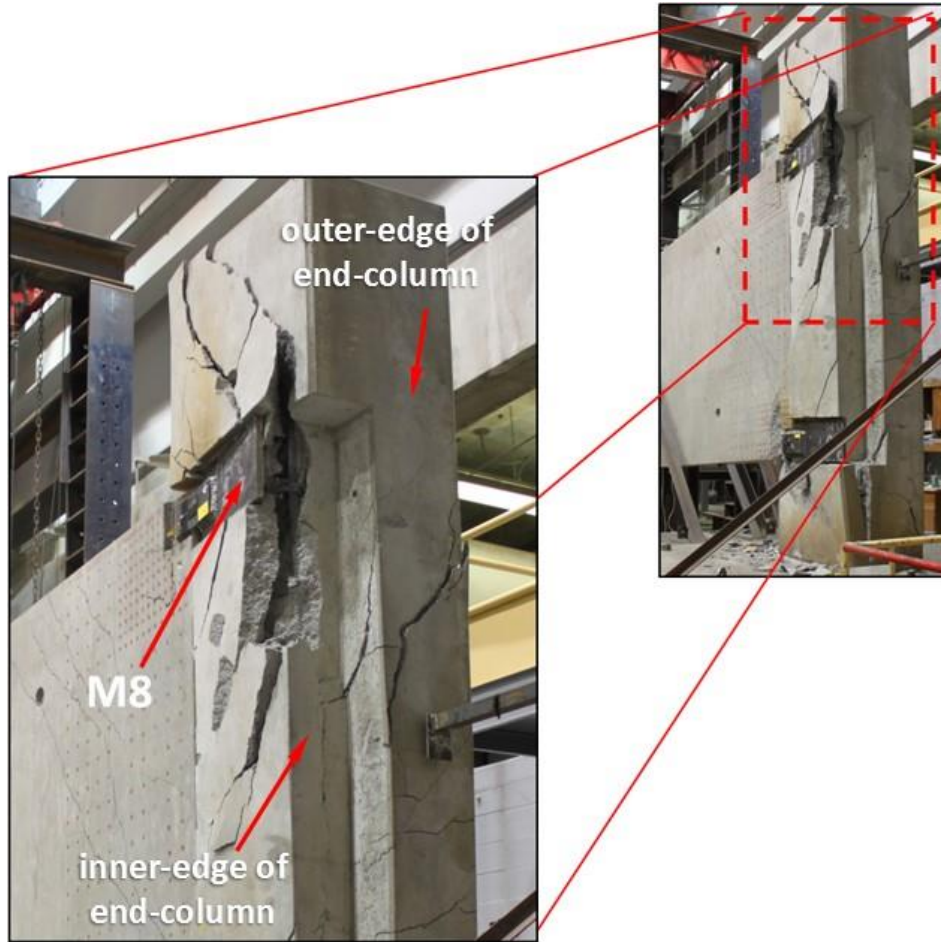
Elevation views, detachment of the upper M8 plate in the right (west) end-column
